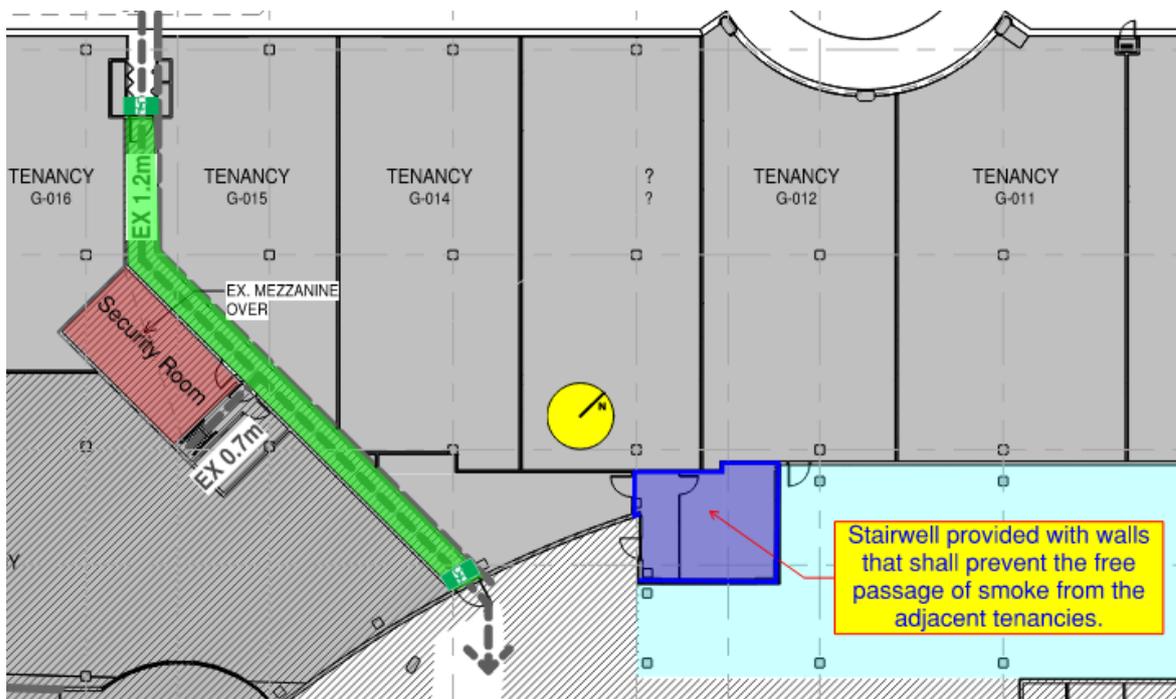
Walls that shall prevent the free passage of smoke on Ground Floor
